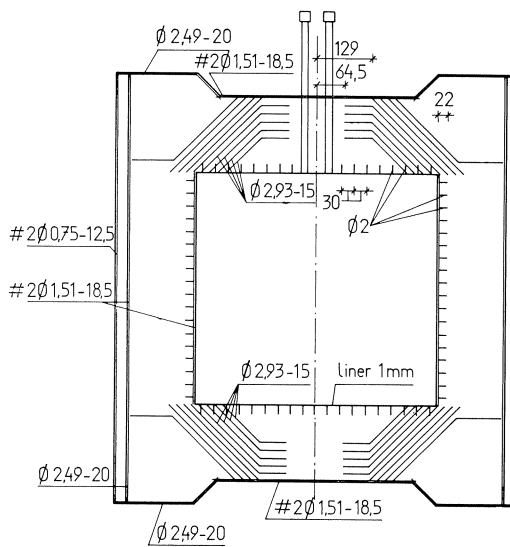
Vertical section through pressure vessel: untensioned reinforcing steel.
